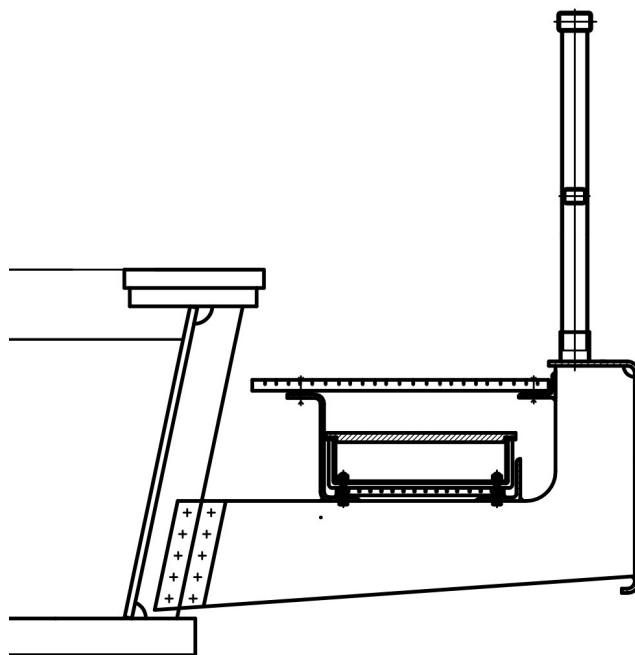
A service route outside the supporting structure, e.g. on brackets
